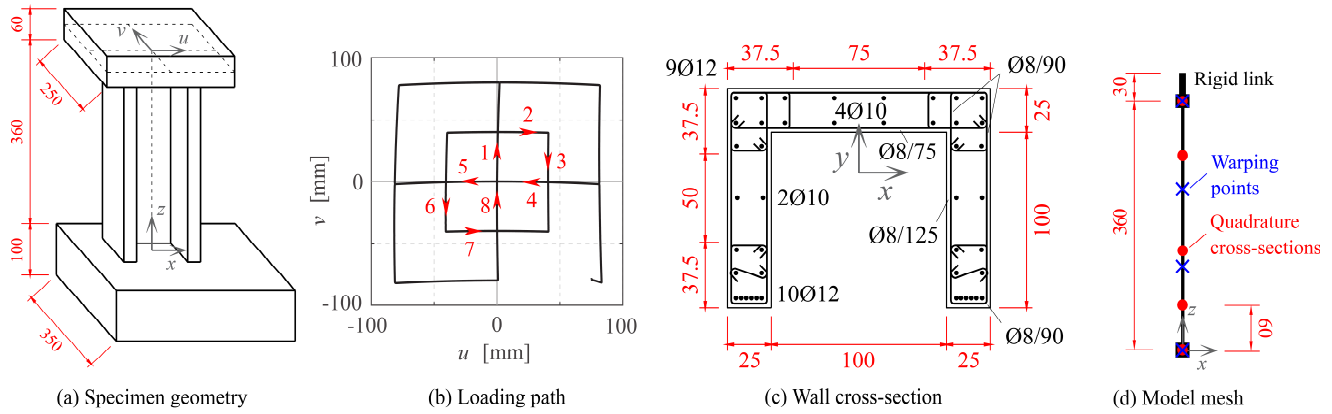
U-shaped RC shear wall: (a) geometry, (b) loading path, (c) cross-section (dimensions in cm) and (d) mesh details
